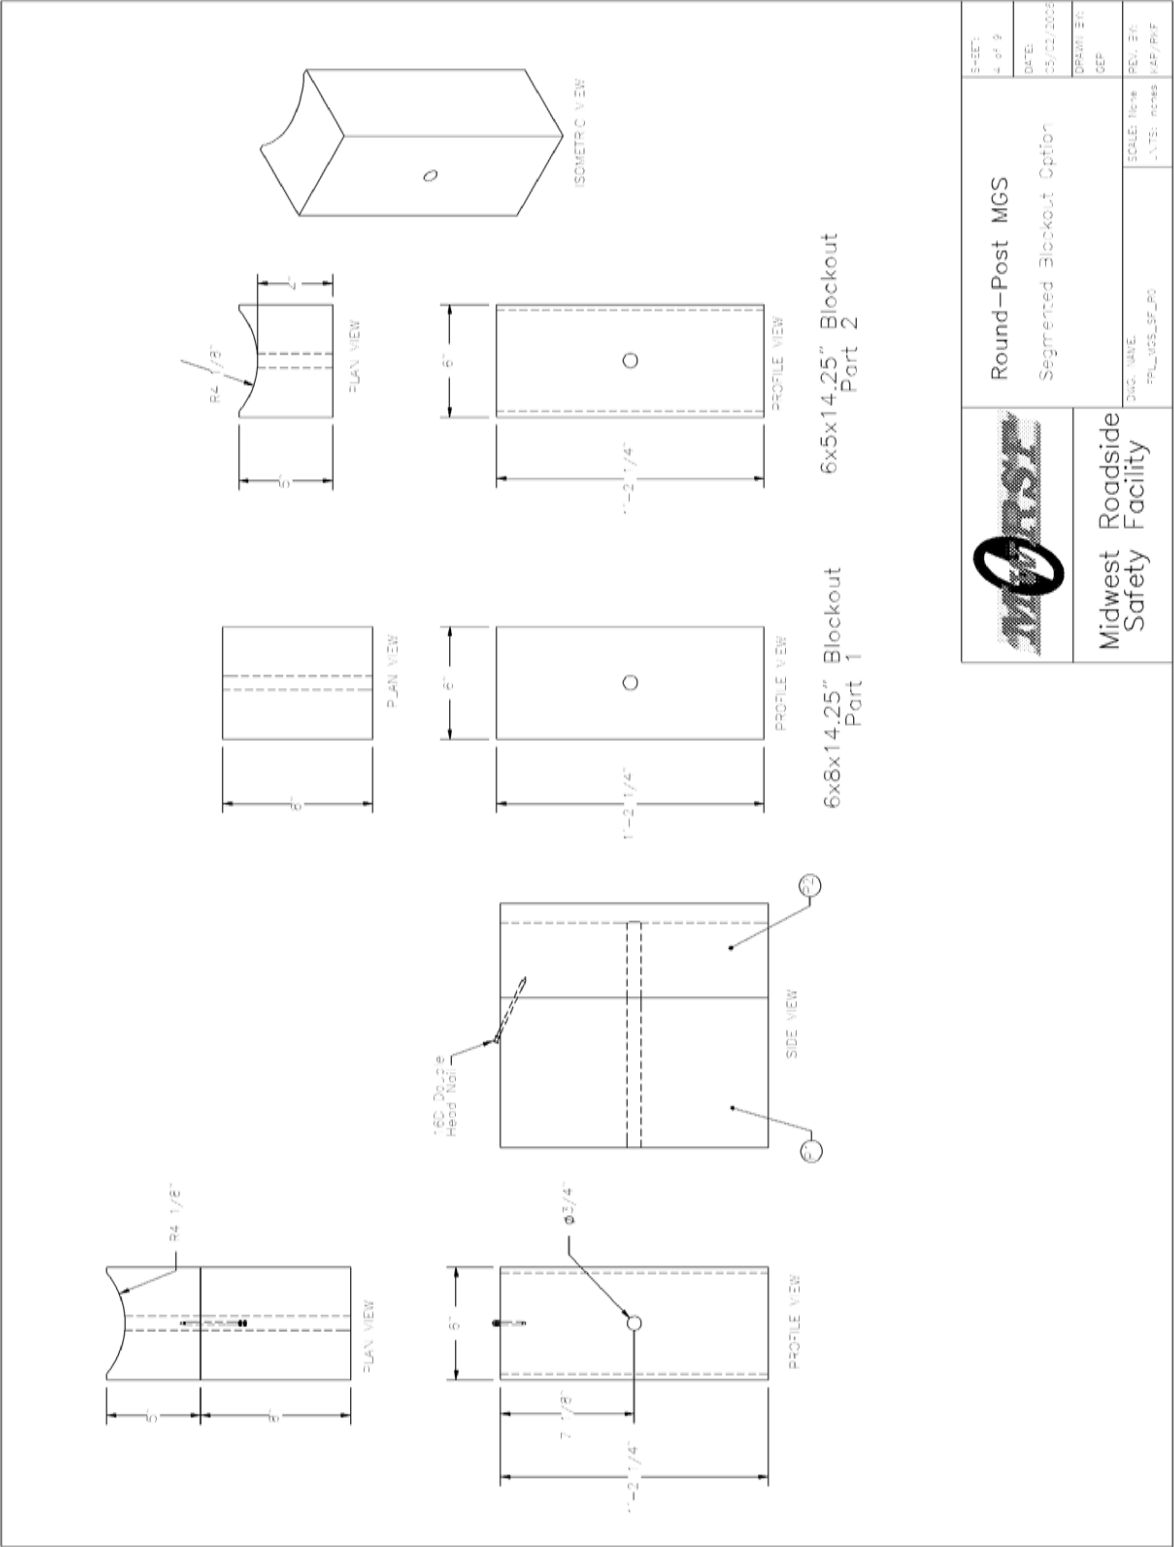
MGS Round Post Southern Pine English Details – Segmented Blockout Detail
